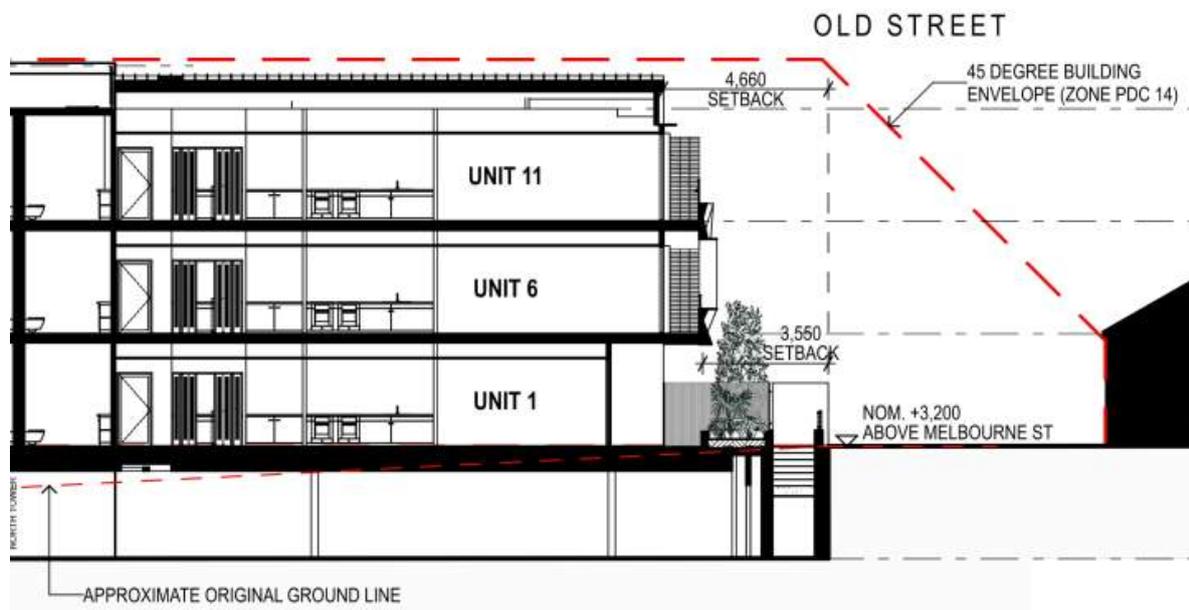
above, clearly demonstrates that the proposed building will be entirely located within the envisaged building envelope plan, satisfying Principle 14. Further to this, the design presents an orderly visual transition with the adjoining North Adelaide (Conservation) Zone as:
